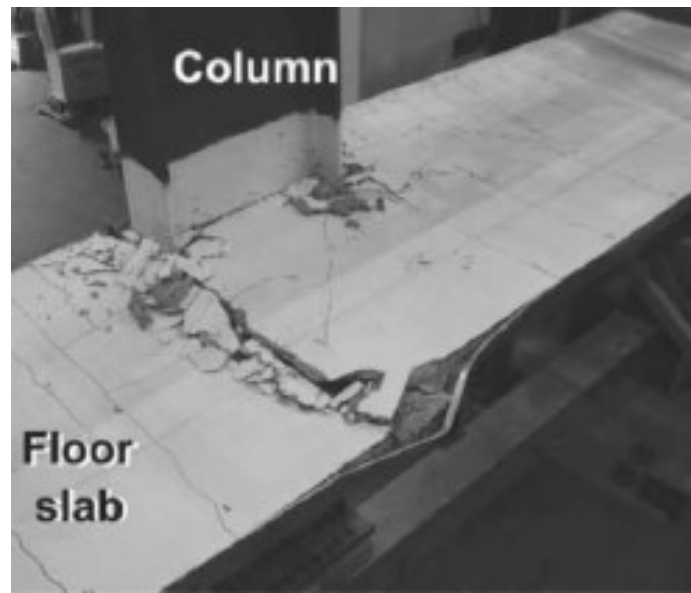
Floor slab damage at column face comprised of W920×344 RBS connected to W920×223 column (Zhang and Ricles 2006)
